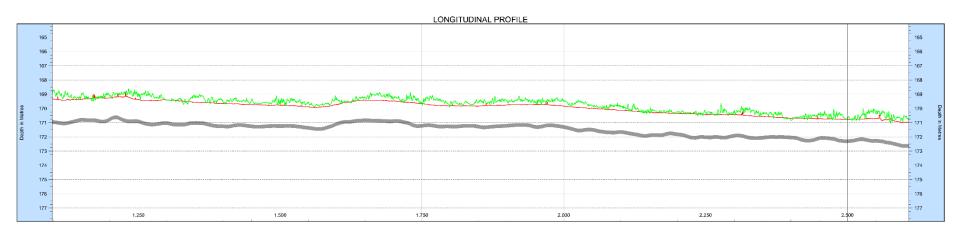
PL4556 As-built alignment sheet KP1.098 to KP2.608
